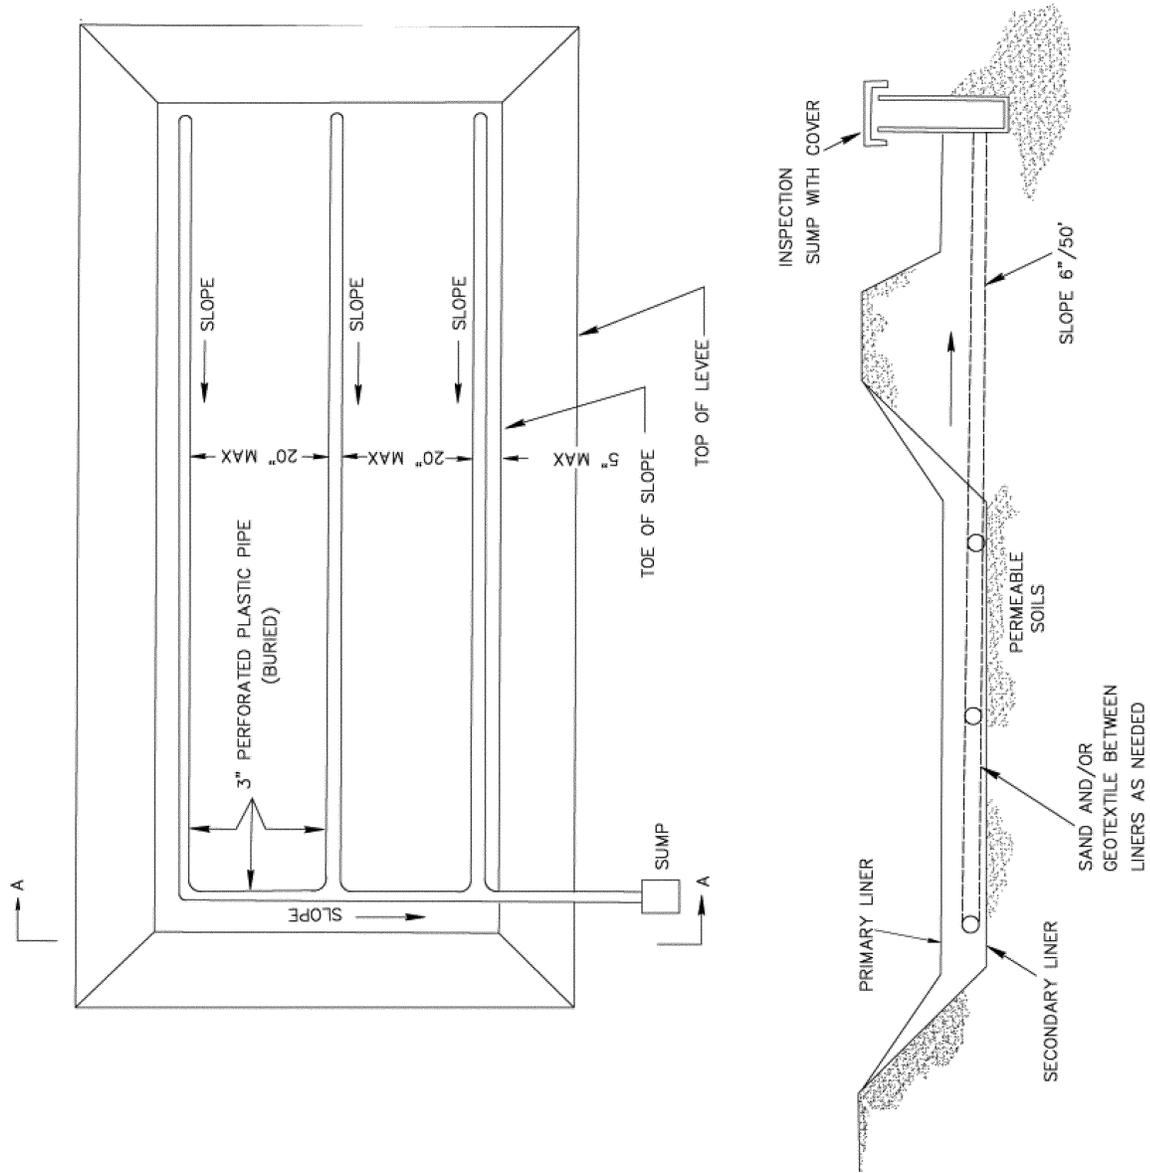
EXAMPLE OF A LEAK DETECTION SYSTEM FOR A LINED PIT CONSTRUCTED IN PERMEABLE SOILS.
